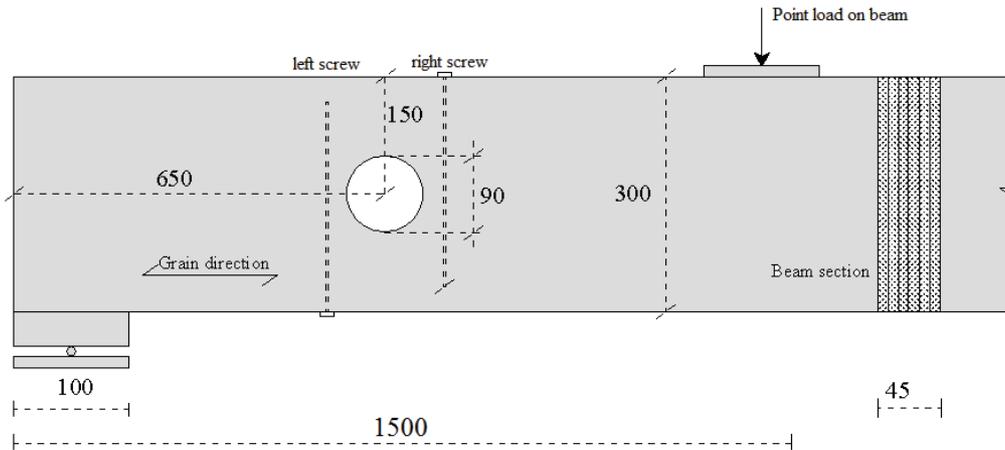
Beam with hole reinforced with screws (dimensions in mm).
